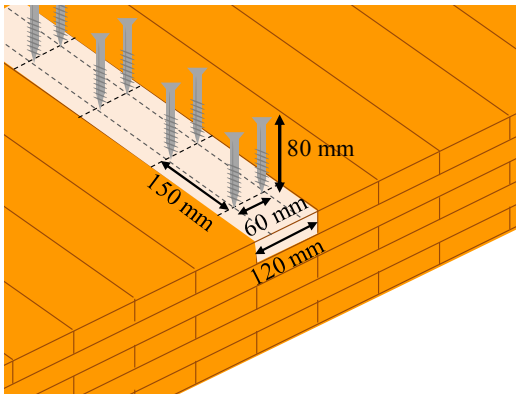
(Color available online) Cross laminated timber : Spline joint.
